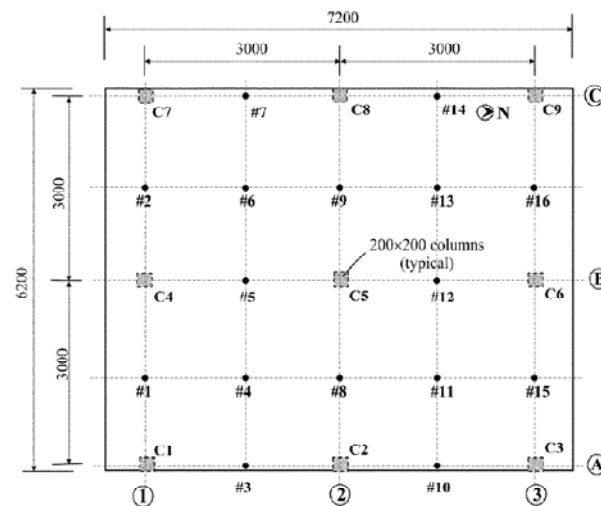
Plan of each slab and dial gauge locations (no. 1 to 16) (Gilbert and Guo, 2005).
